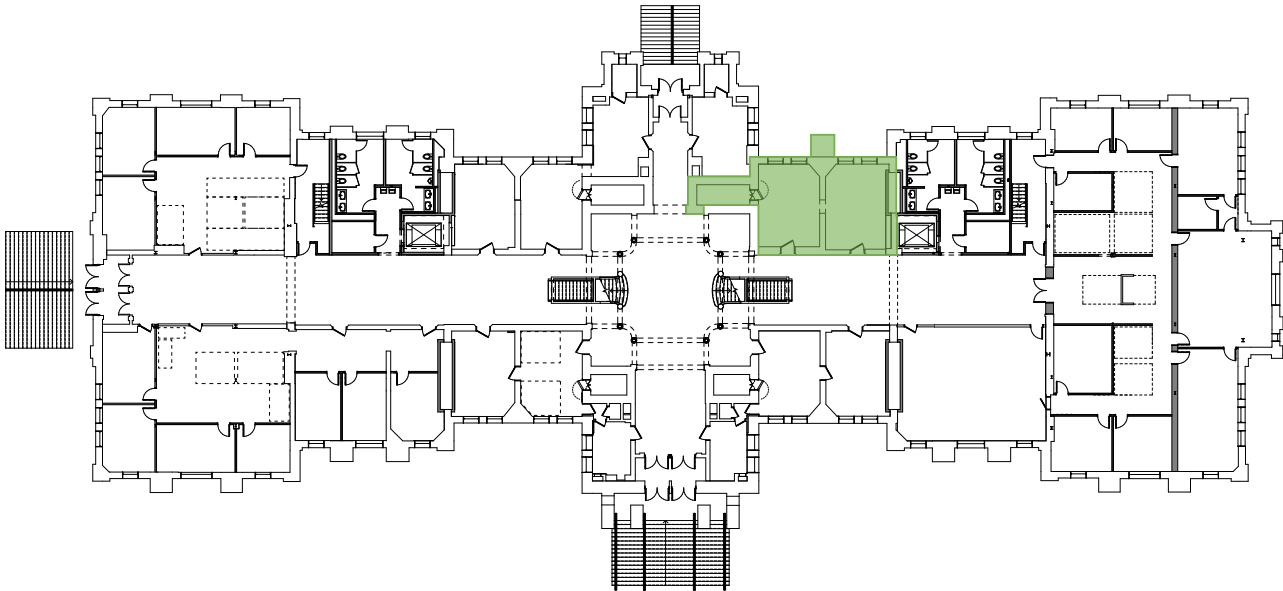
Proposed Space Allocation: Attorney General - First Floor [Capitol]
